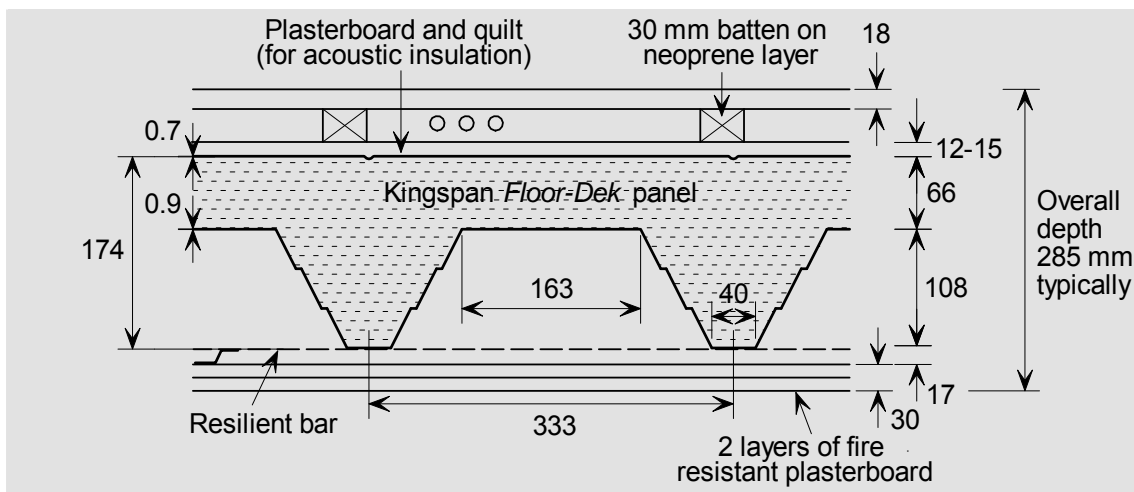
Floor-Dek* as a separating floor in residential buildings
